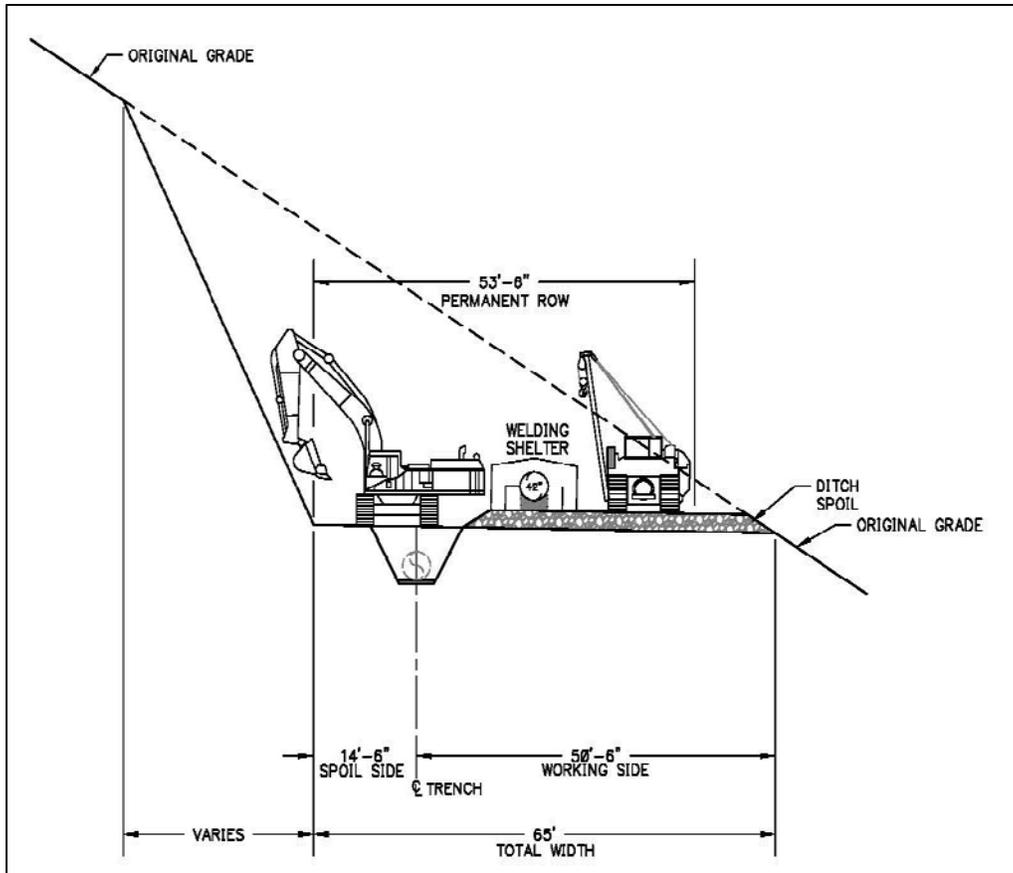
Right-of-Way Construction Mode 5B–Mountain Grade
